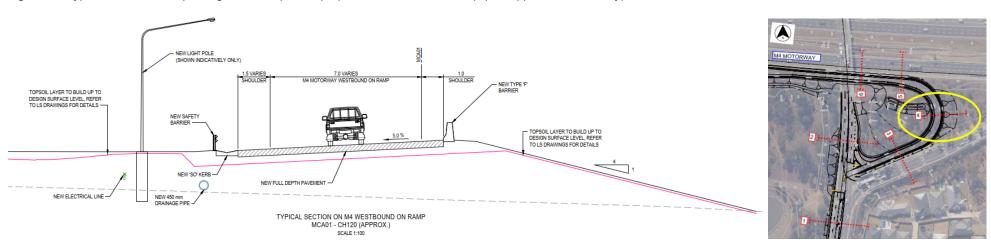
Typical cross section (looking north) of the proposed westbound on-ramp (G-loop)
